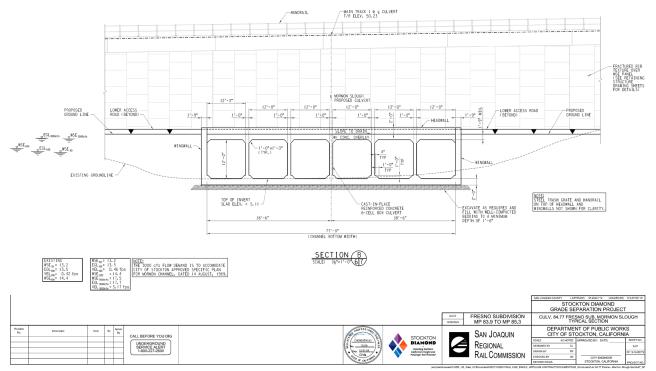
The proposed six-cell culvert. The proposed culvert will be 77 feet wide and 261 feet long and will create five one-foot-wide piers in the Mormon Slough with 12-foot-wide and 12-foot-tall openings between each cell (HDR 2024).
